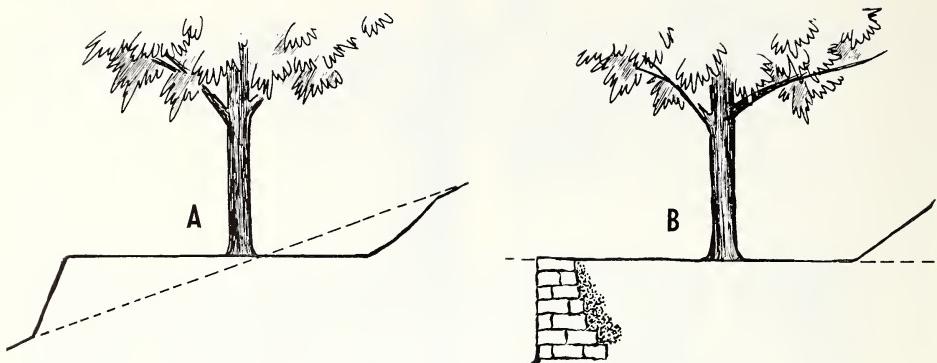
Preserving a maximum of roots when lowering a soil grade. A. By terracing, B. By erecting a retaining wall. The original soil grades are shown by the dotted lines.
